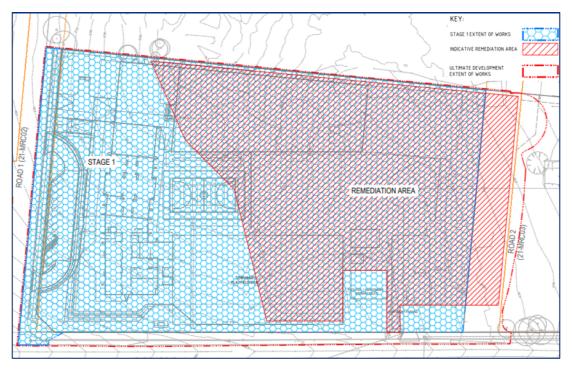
| Proposed Stage 1 extent of civil works (Source: Applicant's Modification Report)
